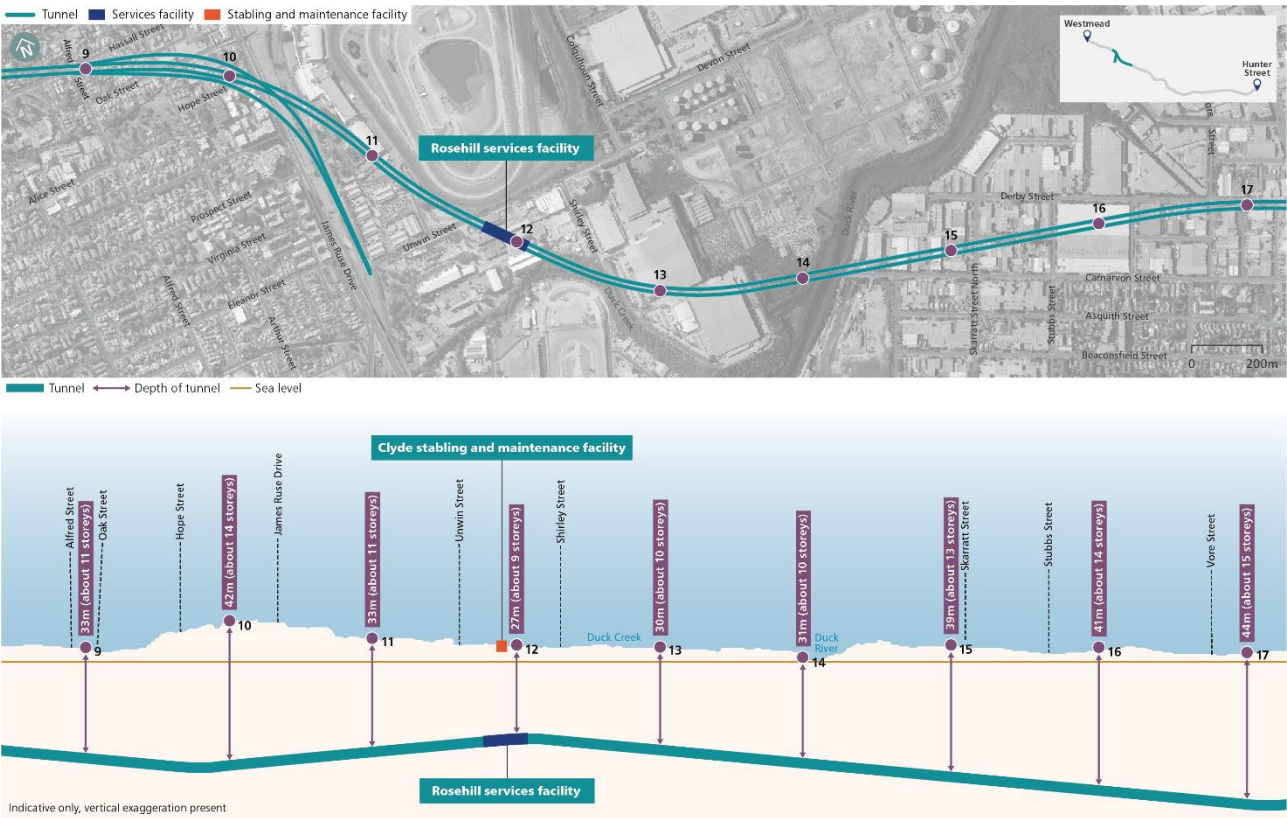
Indicative alignment plan and long section (2 of 8)
